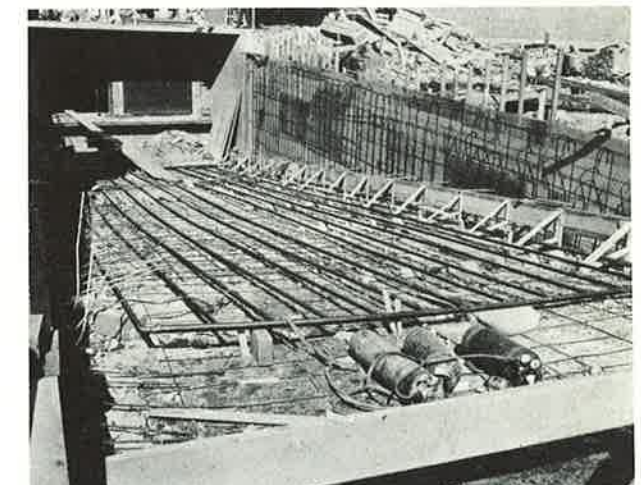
(above): Snow melting installation under driveway to below-grade storage space at Star Market, Newtonville, Mass. Figure 7 (below): Snow-free loading space at the plant of The Swiss Chocolate Co., Inc., Fulton, N. Y.
